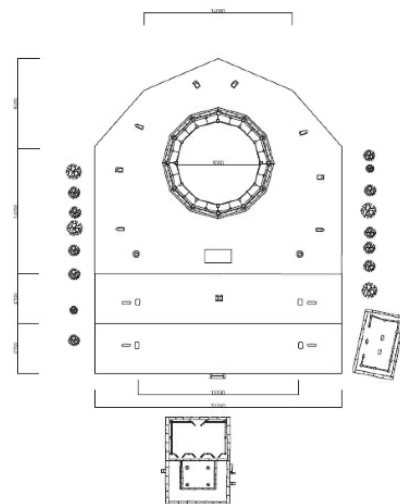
Floor plan of Je-reung (NICH, 2009, 184)
